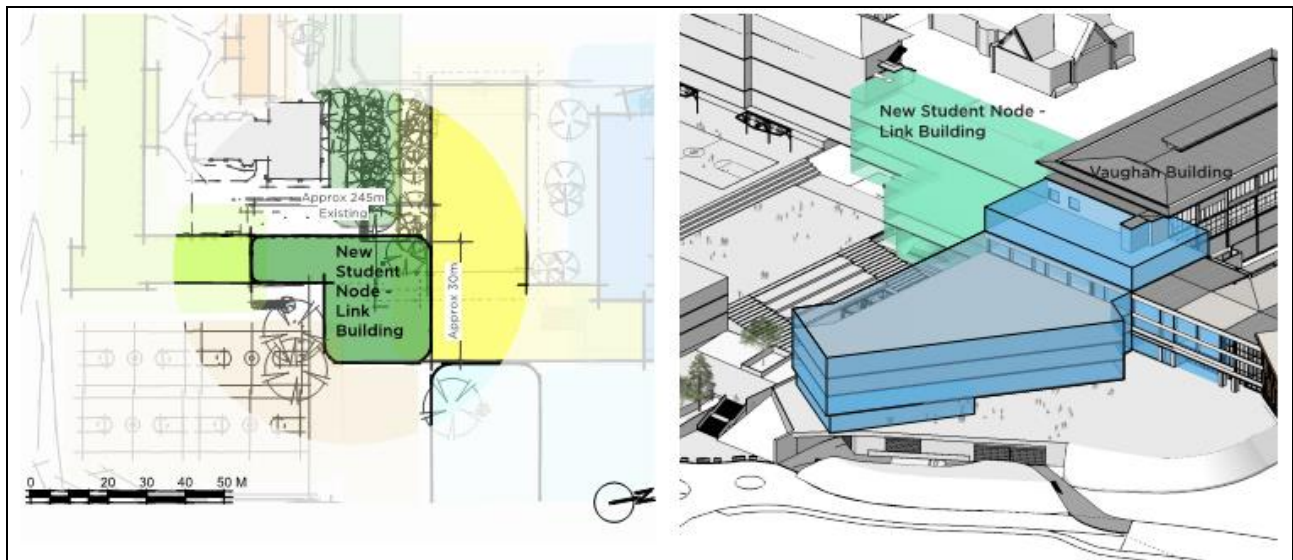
Proposed New Student Node – Link Building (Source: PMDL, 2019)
